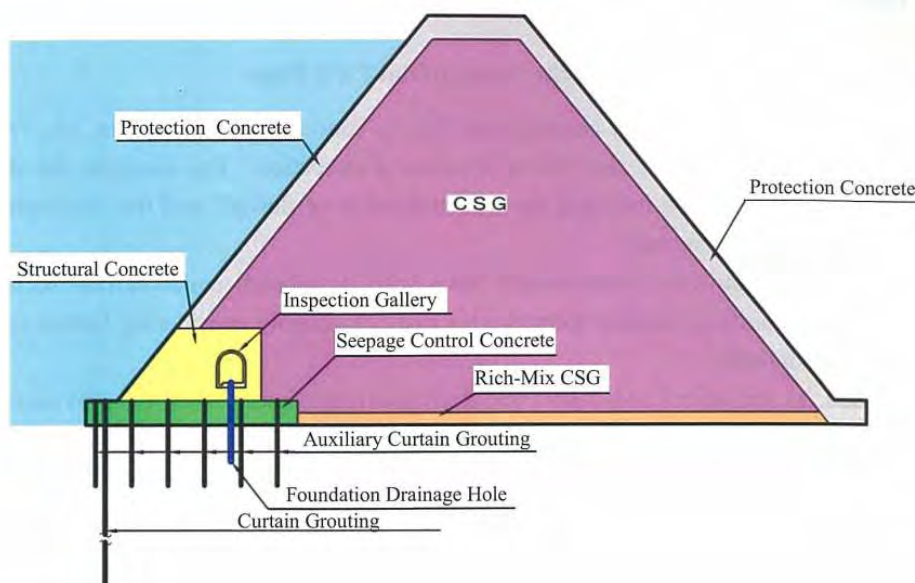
Standard Cross Section of the Trapezoidal CSG Dam
